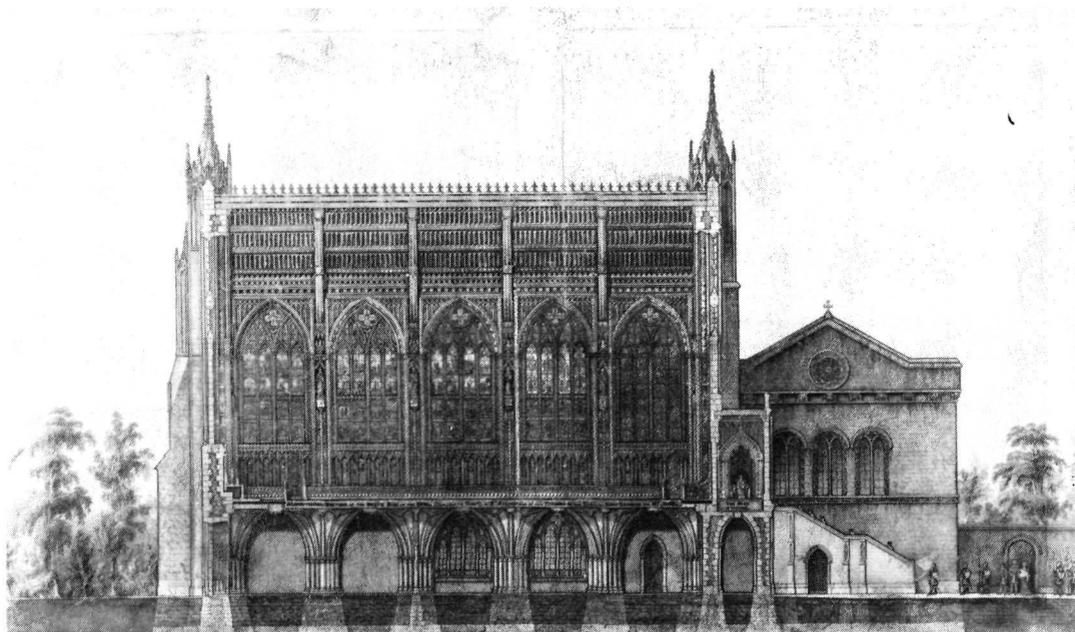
Adam Lee: Longitudinal section of the south side of the building also showing the west end staircase and the north end of the adjoining Guildhall.
